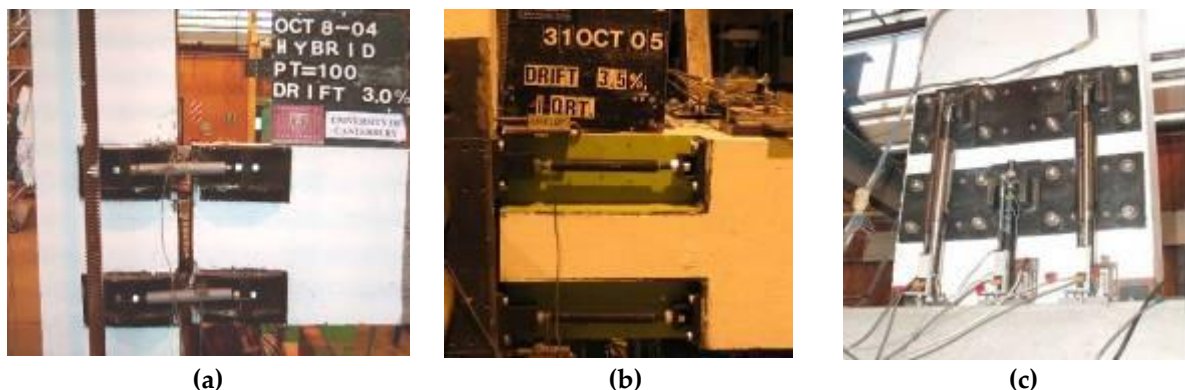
Alternative configurations of external dissipaters for hybrid systems: (a) and (b) beam-column connections, with recesses in the beam (from Pampanin et al., 2006); (c) wall to foundation connection (from Marriott et al., 2006b).
